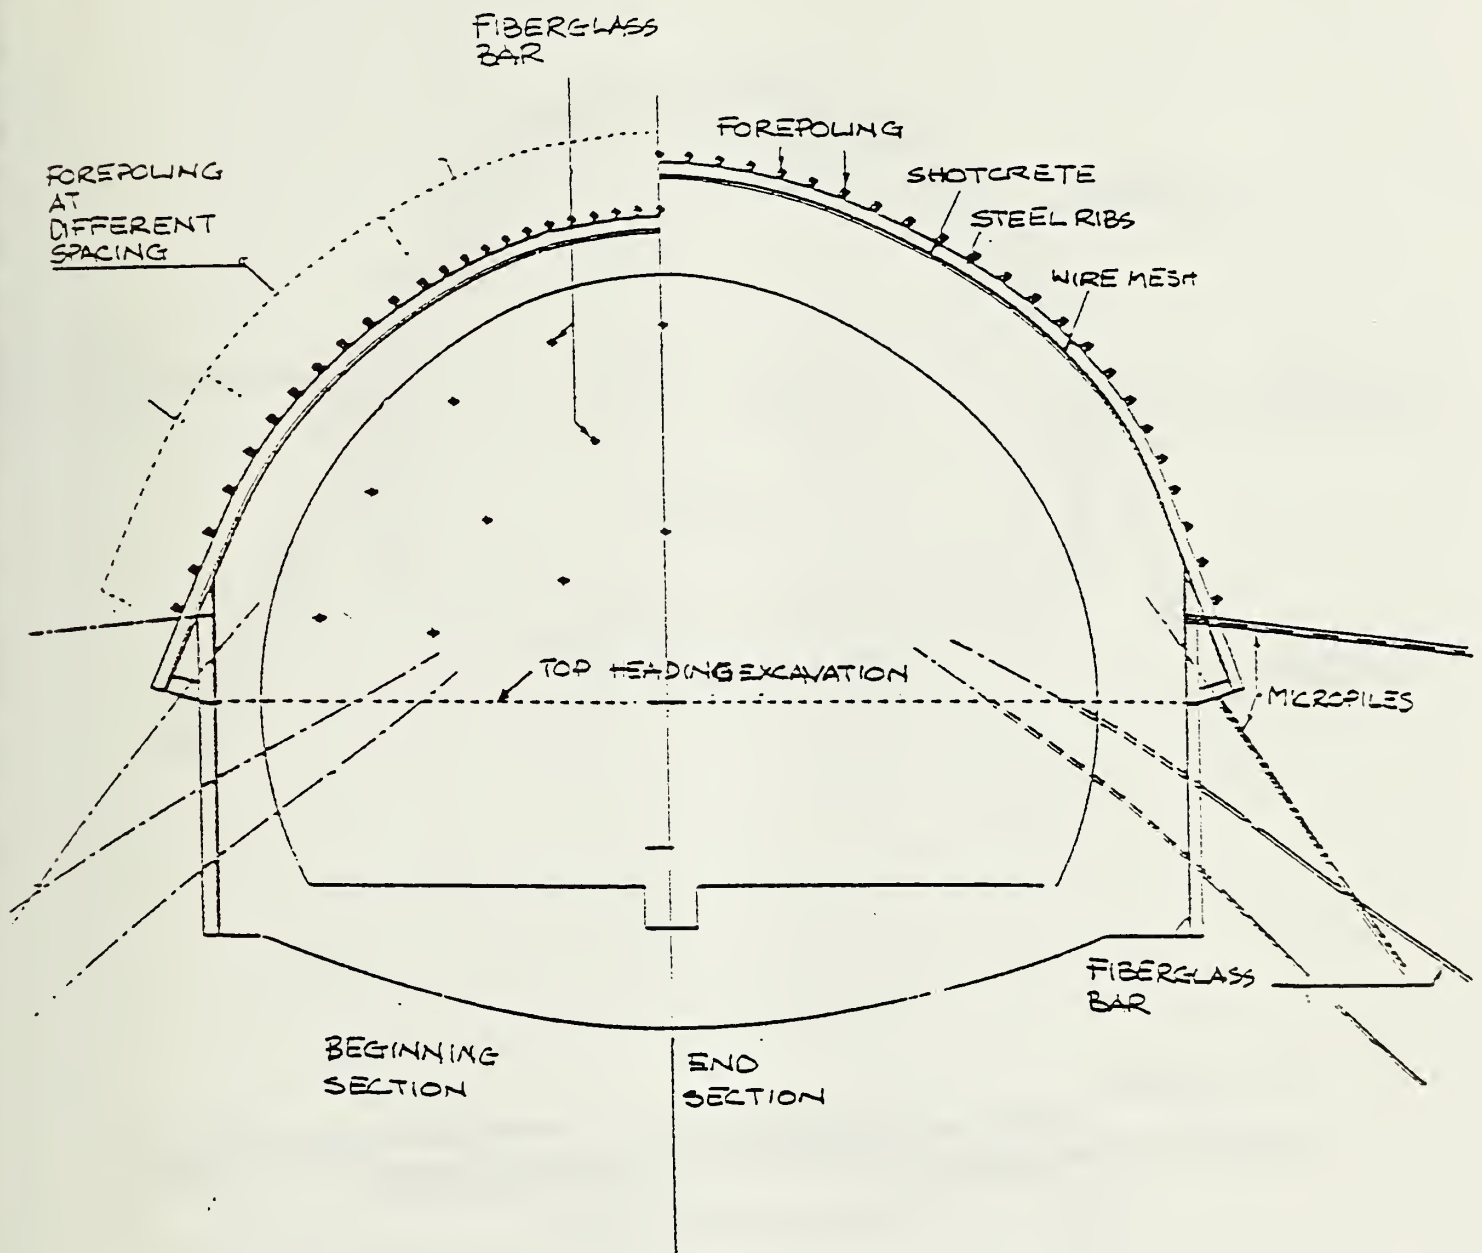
Cross sections of a typical "umbrella-arch". Cross sections at the beginning and at the end of a reinforced segment.
